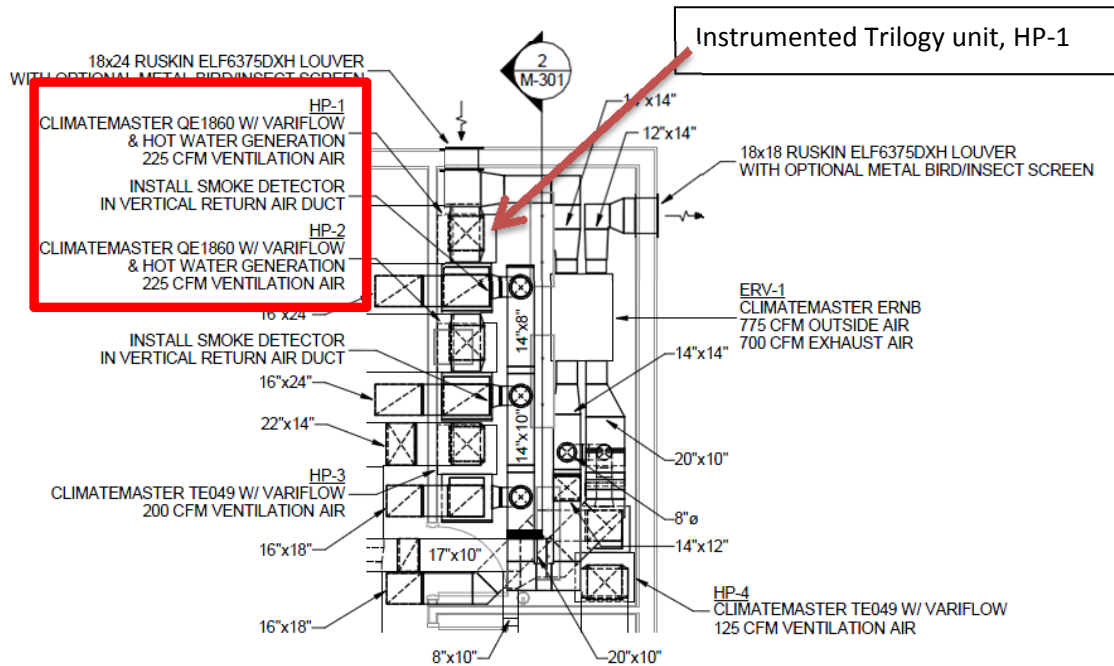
Oklahoma City, OK building mechanical room floor plan; Trilogy units are HP-1 and HP-2 (Source: ClimateMaster)
